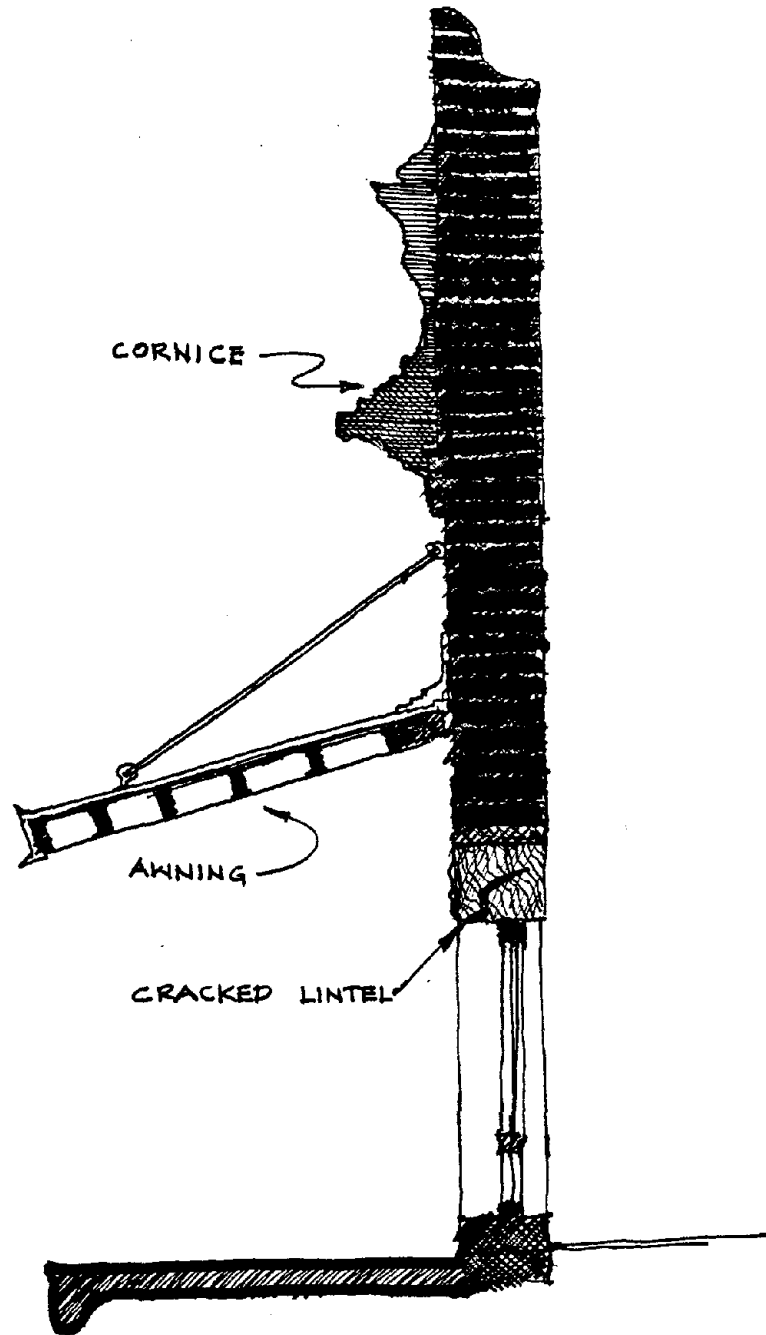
Section of unsecured appendages that appear on many unreinforced masonry buildings. These appendages in the case study buildings in some instances were deteriorated and in some cases overhung the public sidewalk or street.
